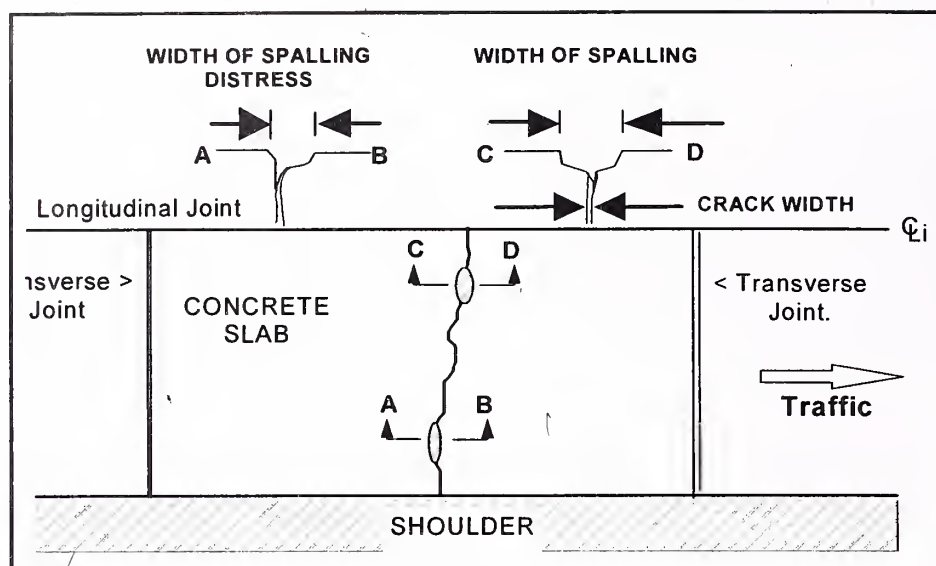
(a) Measurement of Spalling at a Crack
